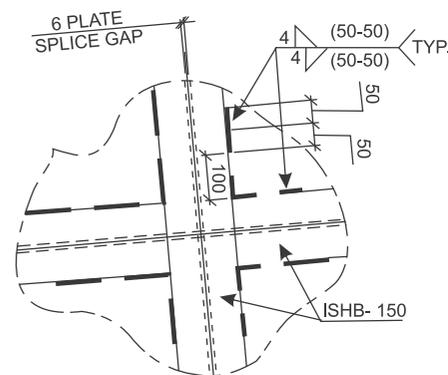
Sketch showing stitch welding of ISHB's with liners
